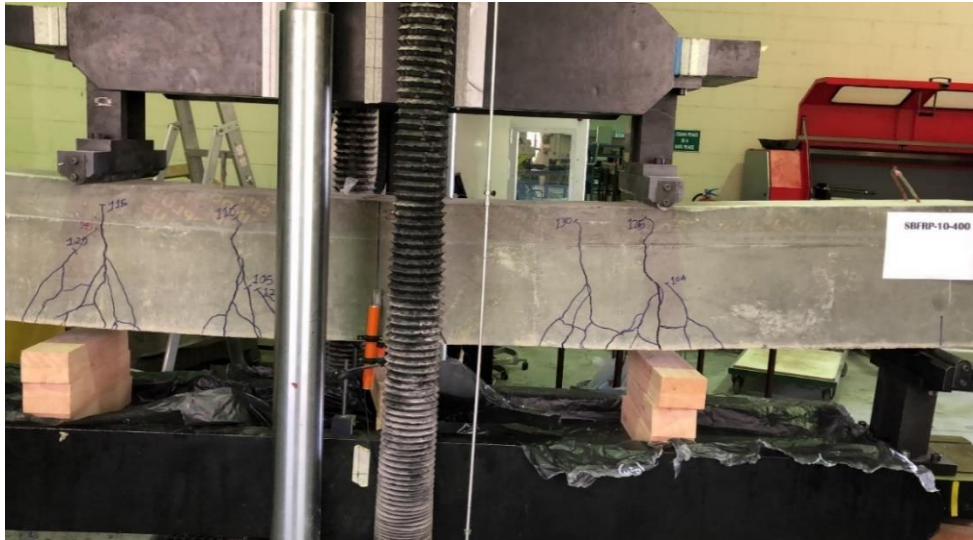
Cracking pattern of beam 1 (SBFRP-10-400)
